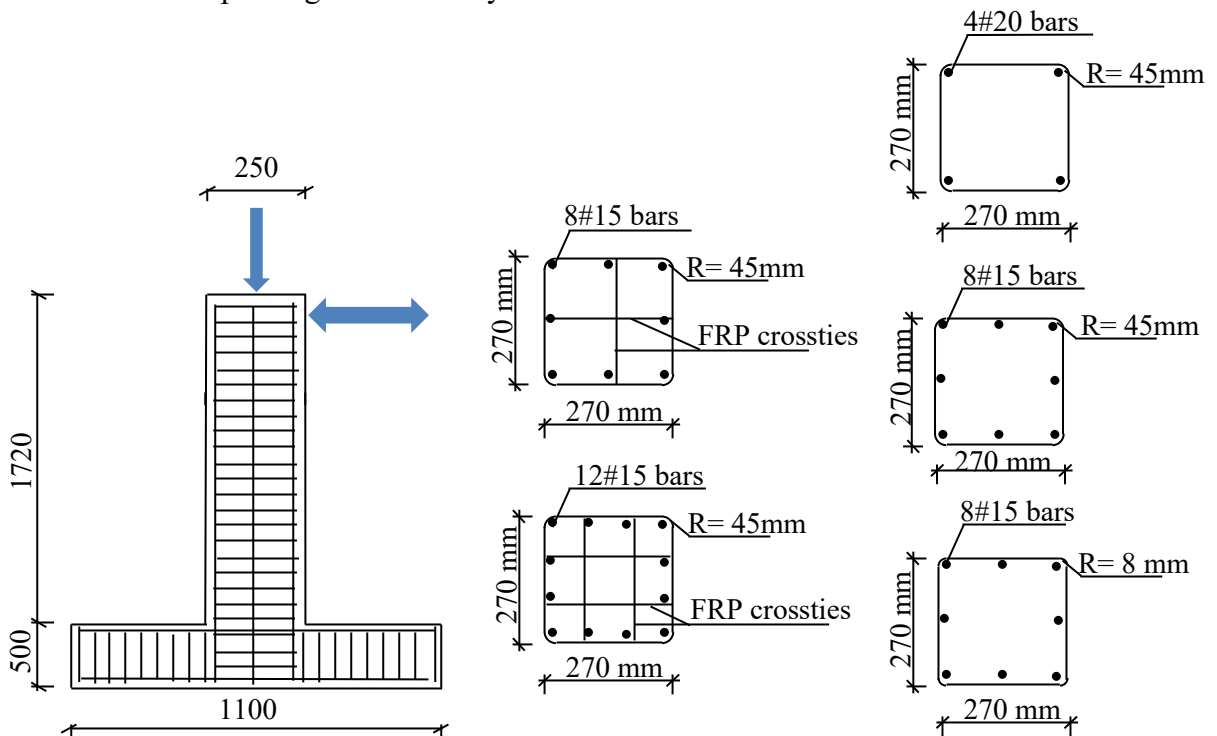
Square high strength concrete column details (Ozbakkaloglu and Saatcioglu 2007)
